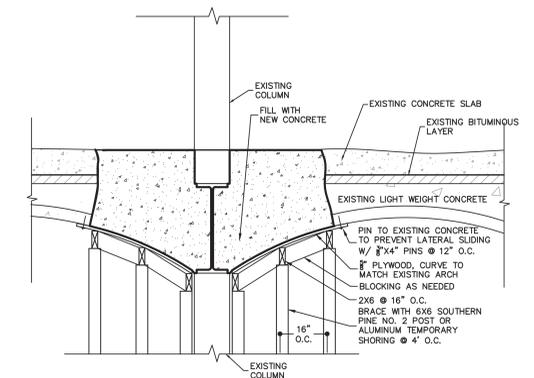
COLUMN AND BRICK REPAIR -
